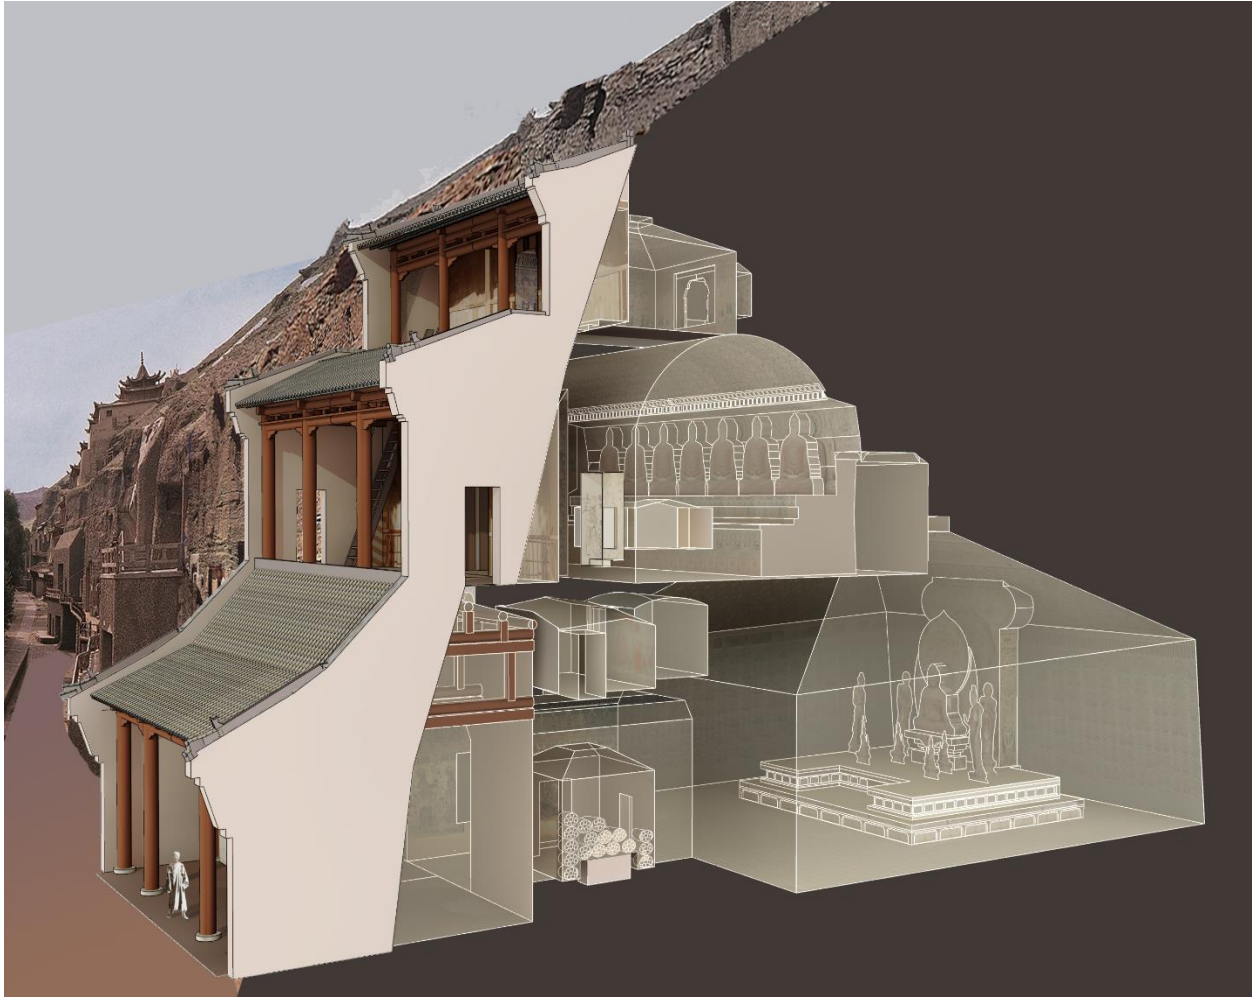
The author's reconstruction of Phase 6 in the construction history of the pavilion. In 1900–6, the niches and altars in Caves 365, 366, and 16 were refurbished, Cave 17 was reopened, and a three-story façade was rebuilt. Caves 364, 365A, 365D, and 366A seemed to have been broken by that time. Drawing by author.
